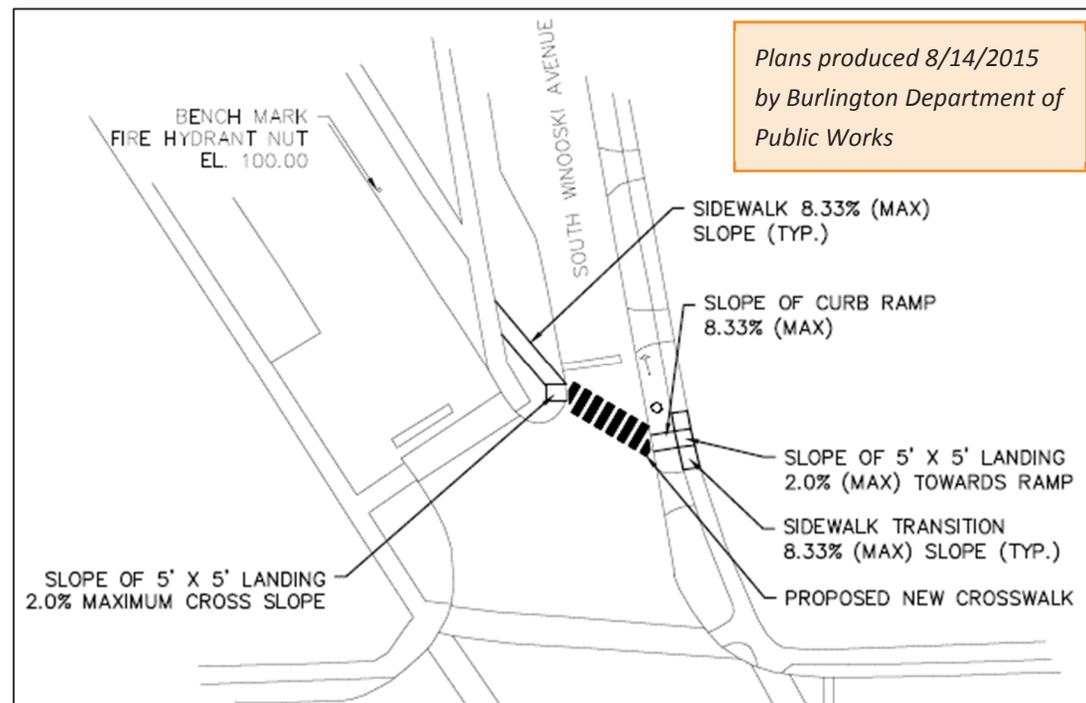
S. WINOOSKI AVE CROSSWALK PLANS
